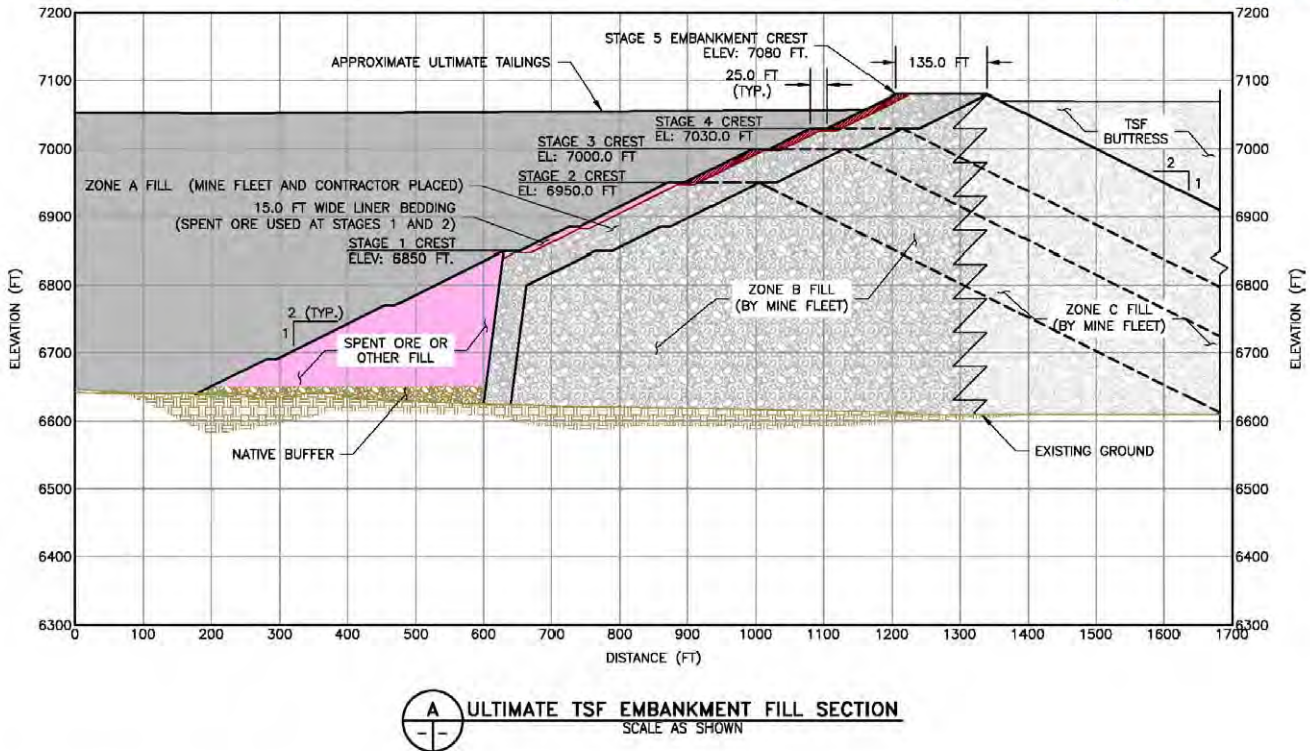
Design Cross Section through TSF Embankment and TSF Buttress
